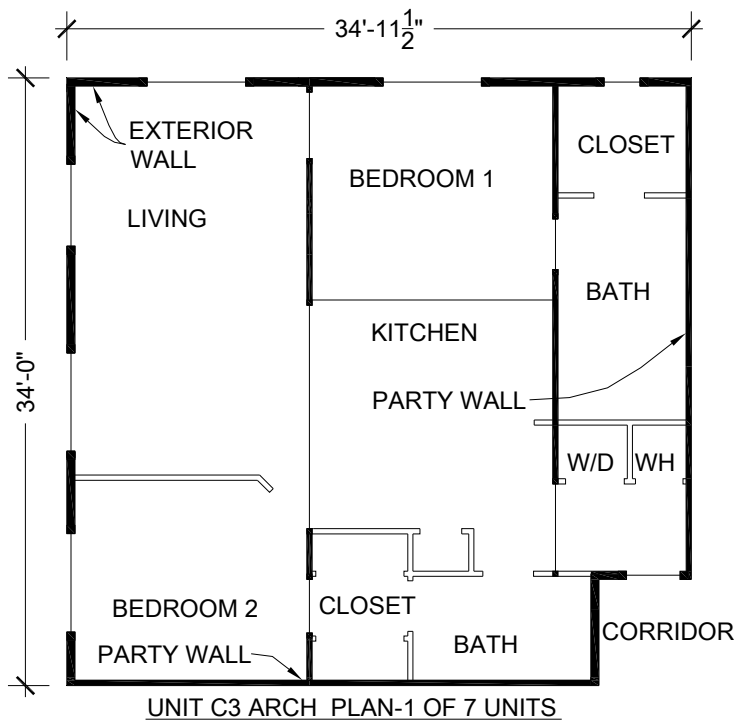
Plan of typical apartment unit at east or west end (1 of 7 unit types). W/D is the laundry and WH is the water heater.
